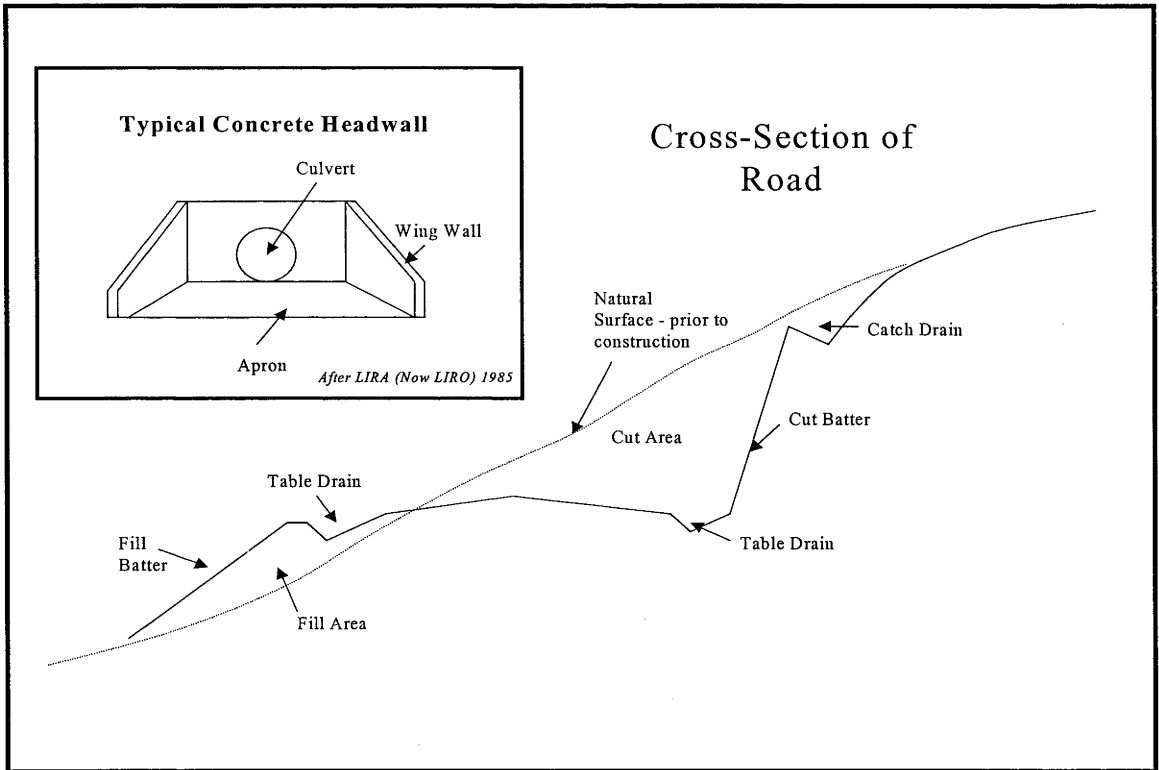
Cross Section of a Forest Road (B). Culvert Headwall Terms illustrated in *Inset* (after LIRO, 1985)
